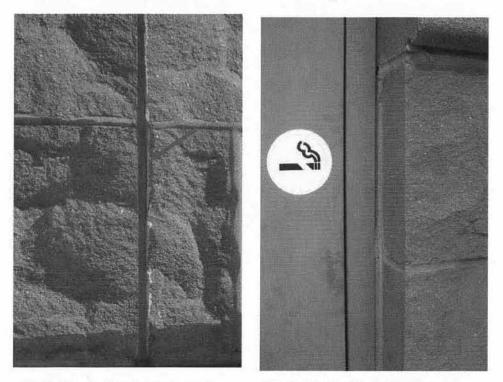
South façade cast stone building base – expansion joint sealant failure.
